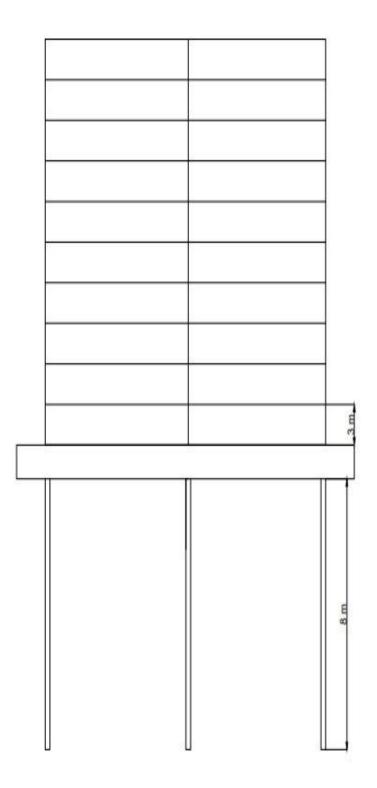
Skeletal building elevation with Combined Piled Raft Foundation consisting of 8 m to 22 m length varying piles
